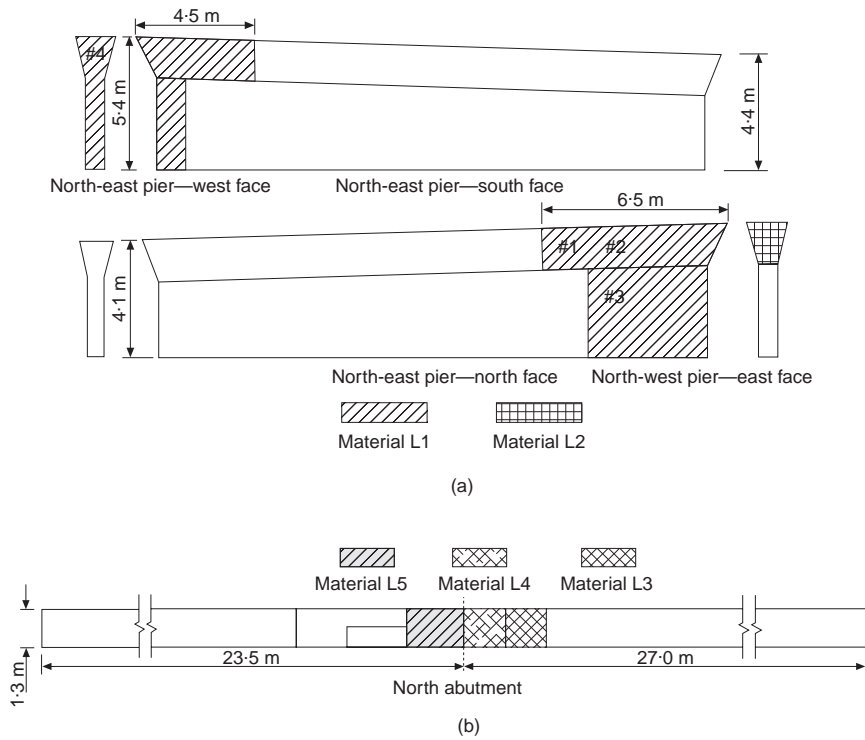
Location of repair patches at Lawns Lane Bridge: (a) elevation of north-east and west piers; (b) elevation of north abutment (not to scale)
